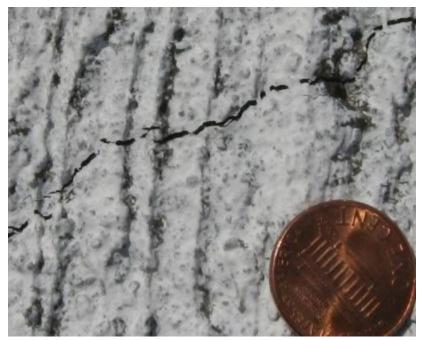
Plastic shrinkage crack after curing compound was applied. Note curing compound spanning over crack at some points. Markham Ravine Bridge.
